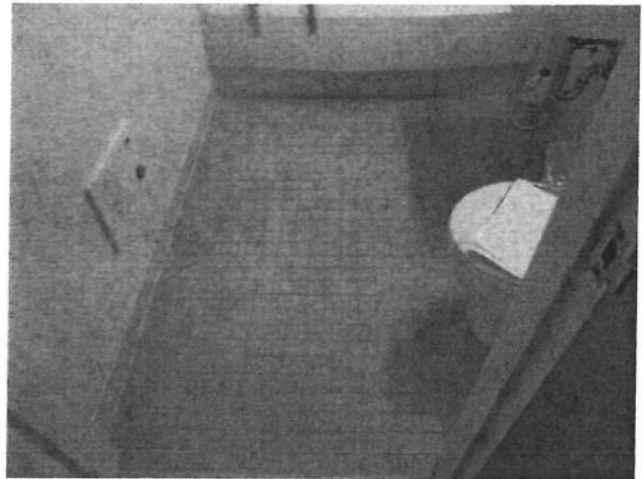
Existing 2x2 Floor Tile - Apt. 301A
